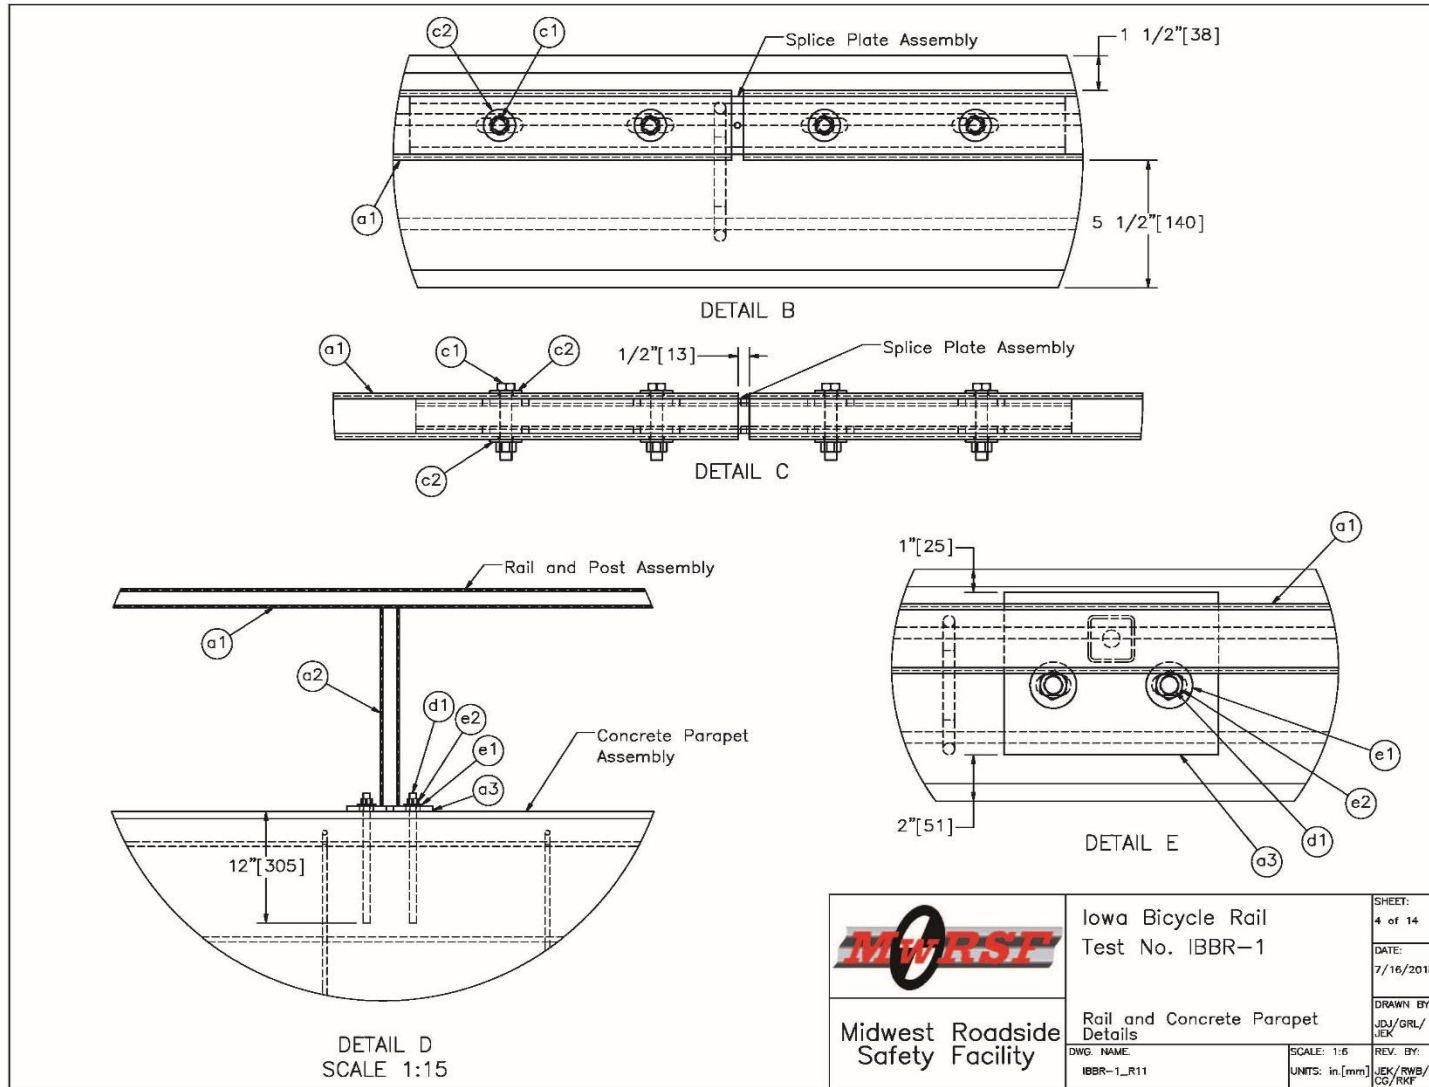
Iowa Bicycle Rail – Rail and Concrete Parapet Details
